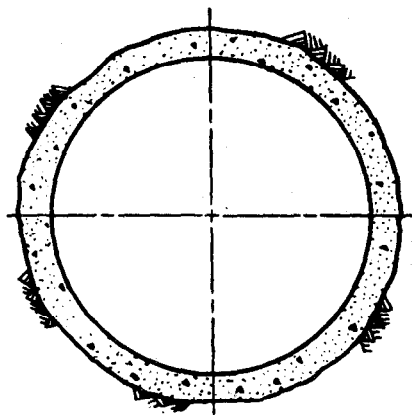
TYPICAL SECTION OF CONCRETE-LINED TUNNELS
